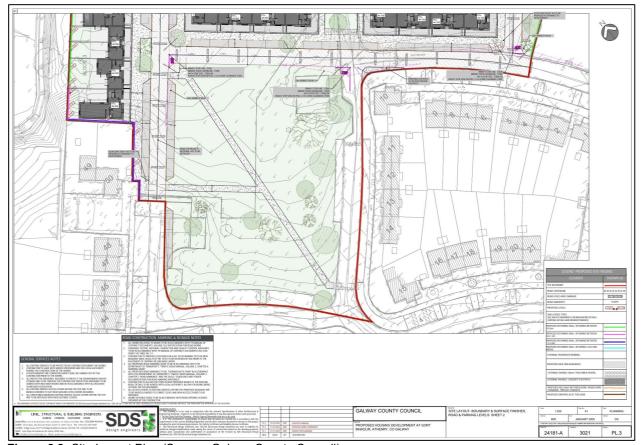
Site Layout Plan (Source: Galway County Council)
